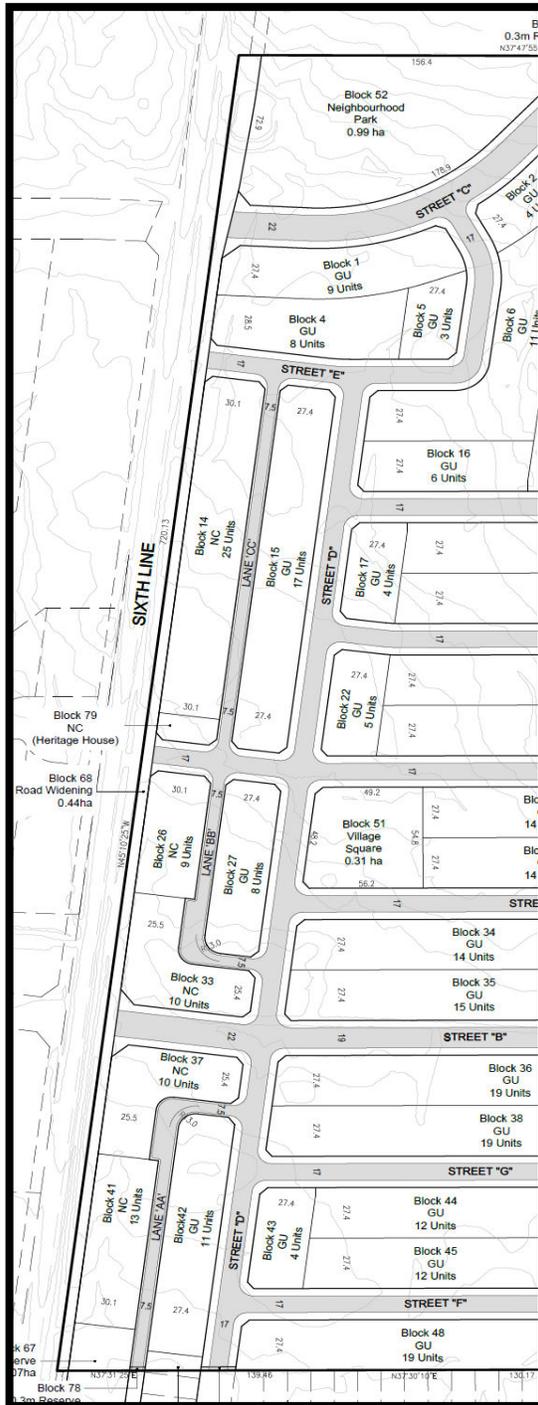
OMB Approved and proposed Draft Plan of Subdivision
